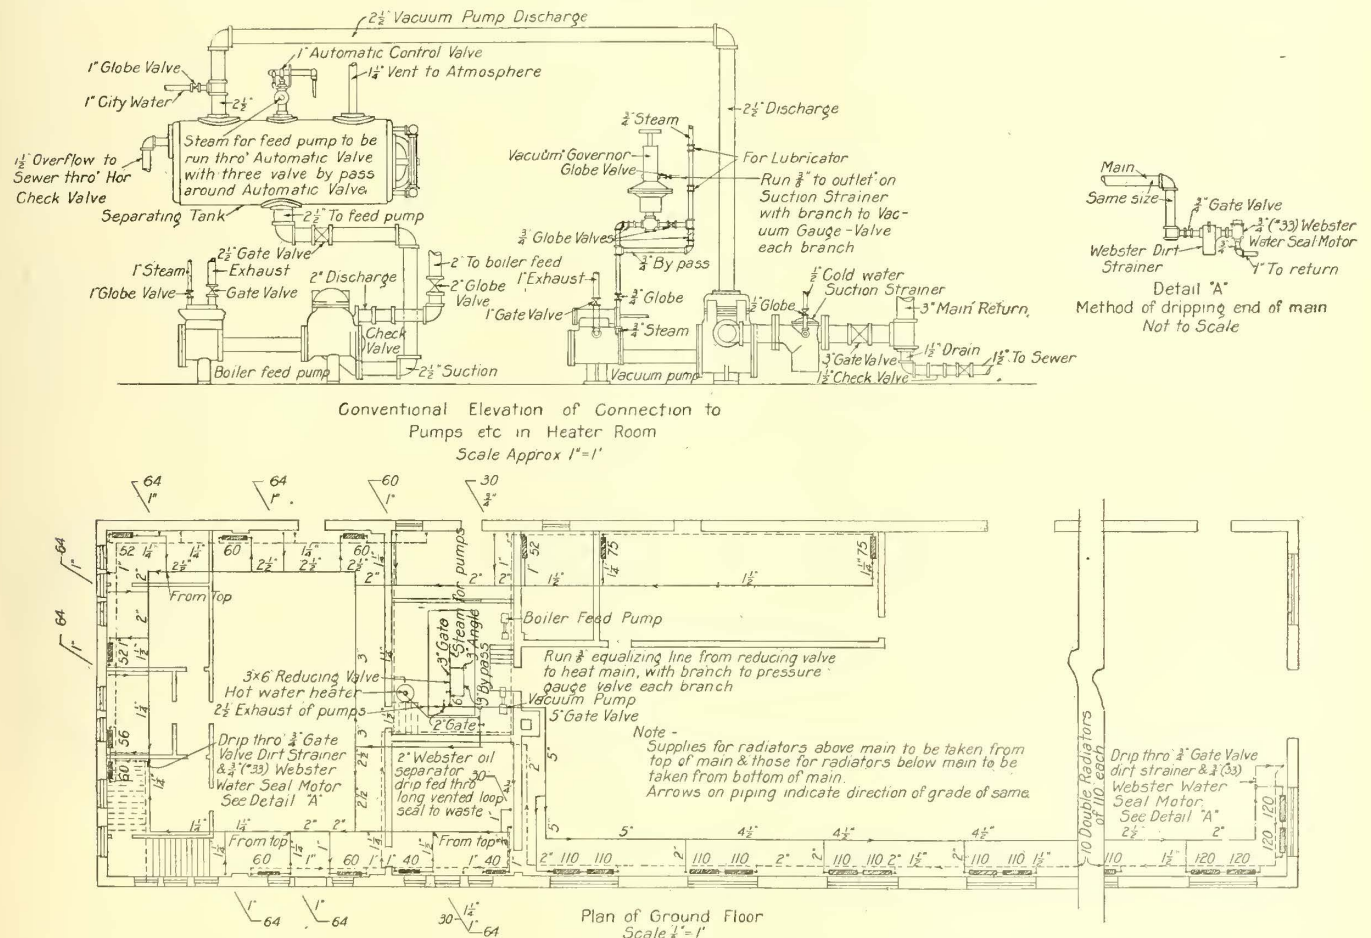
Buildings and Structures—Direct Steam Heating Layout for 100-Car Terminal
